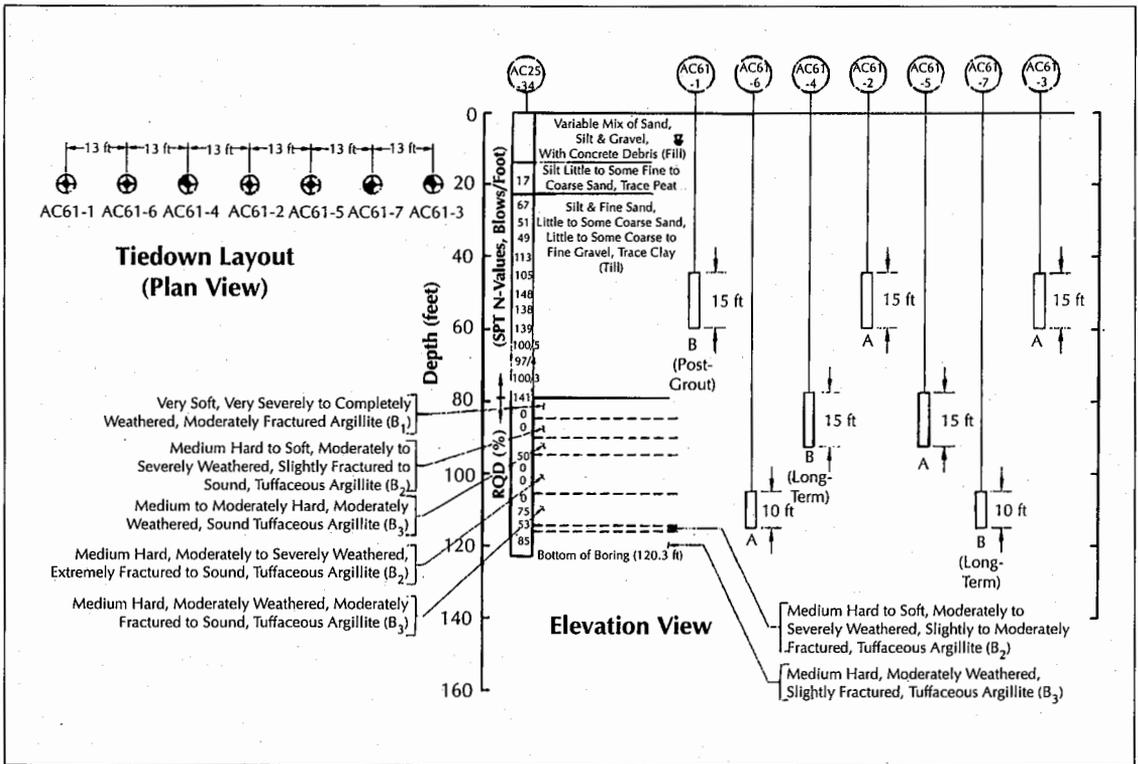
Tiedown layout and subsurface data for Test Site No. 1.
